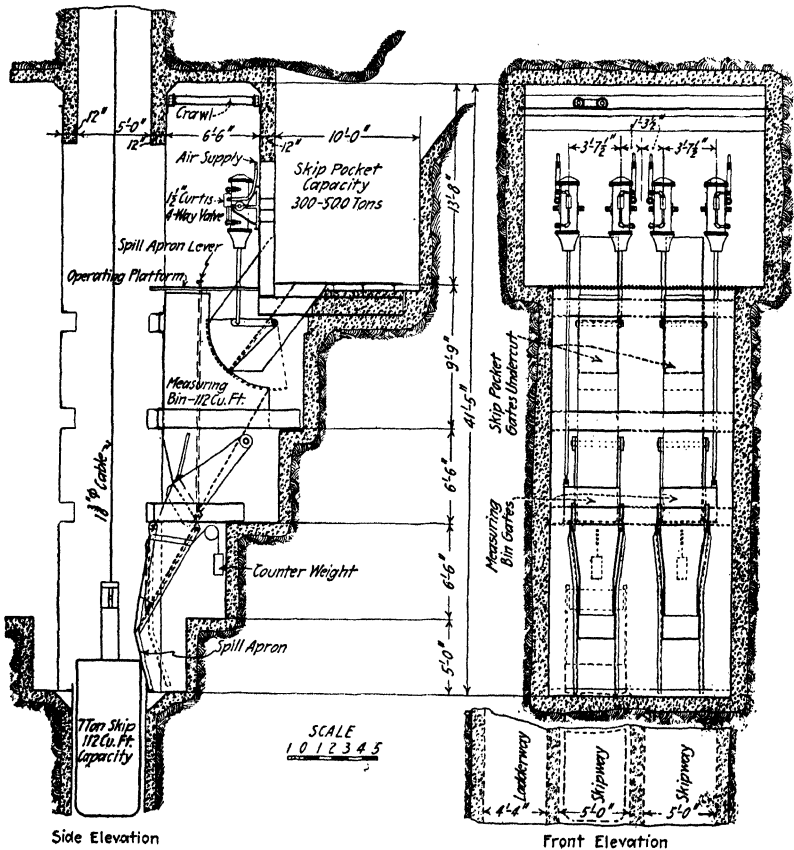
LOADING POCKET—NO. 5 SHAFT.
